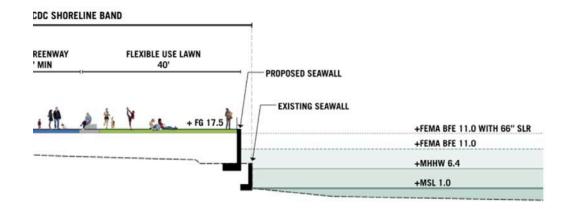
Projected Sea Level Rise of 3.5 feet and 6 feet with Proposed Grading and Seawall
